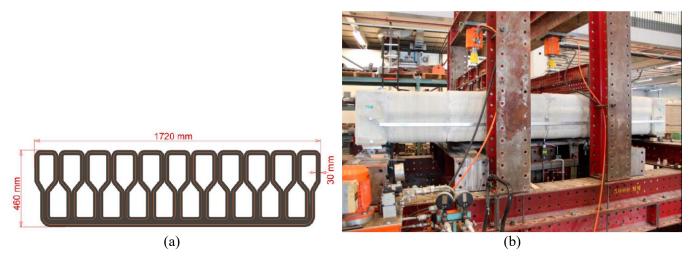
(a) Cross section of the 3D-printed PC beam and (b) Four-point bending test setup of the specimen tested by Salet et al. [9].
